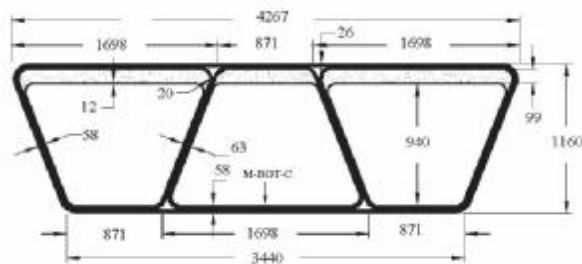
Cross Section of the Hybrid FRP-Concrete System.
